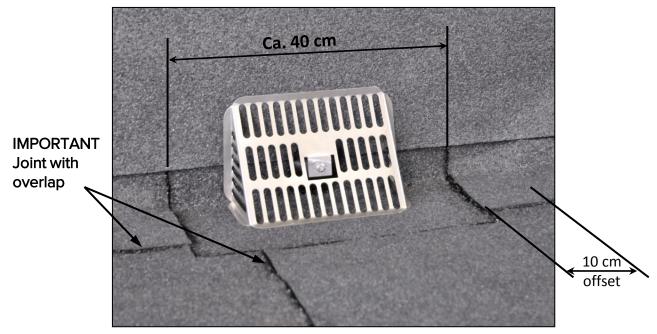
Horizontal roof outlet fully installed with overlapping bitumen membrane lengths and leaf grate.
